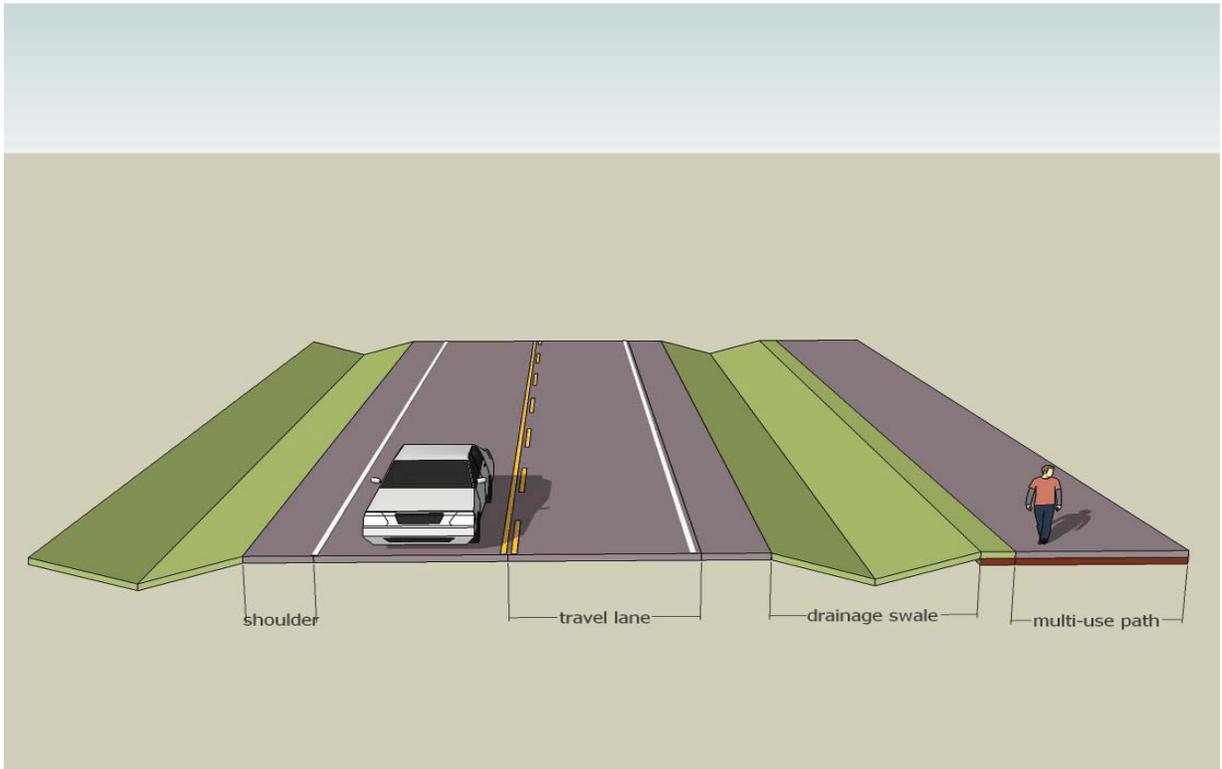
ST-255, Non-Curb and Gutter Section, Light Imprint Development
